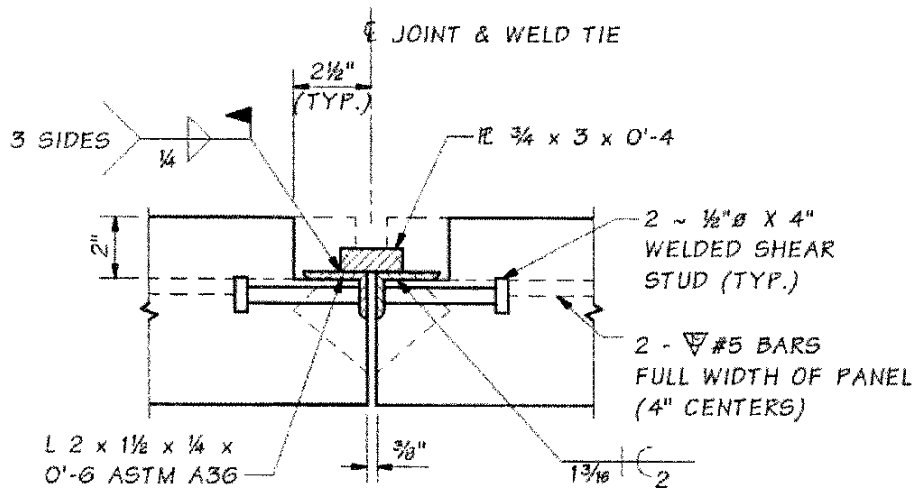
Standard mechanical connection detail (WSBDM 1998)
